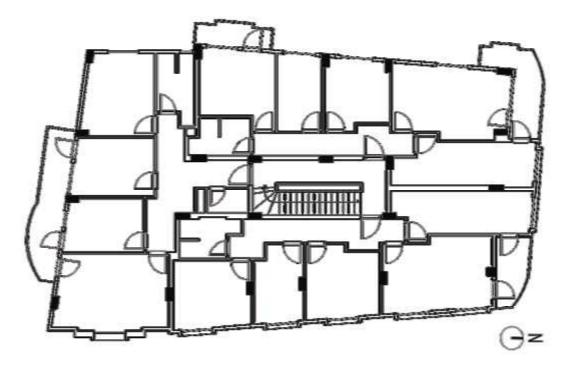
Floor plan of Case Study 3 building. Source: Architect (F. Çalışır)
